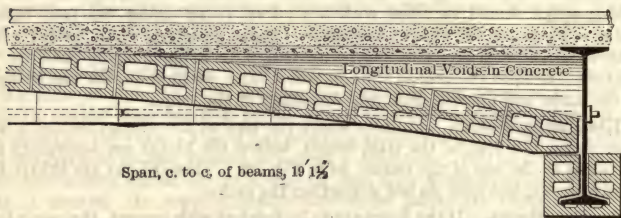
Segmental Tile Floor-arch. Deep Beam. Dropped Skew
